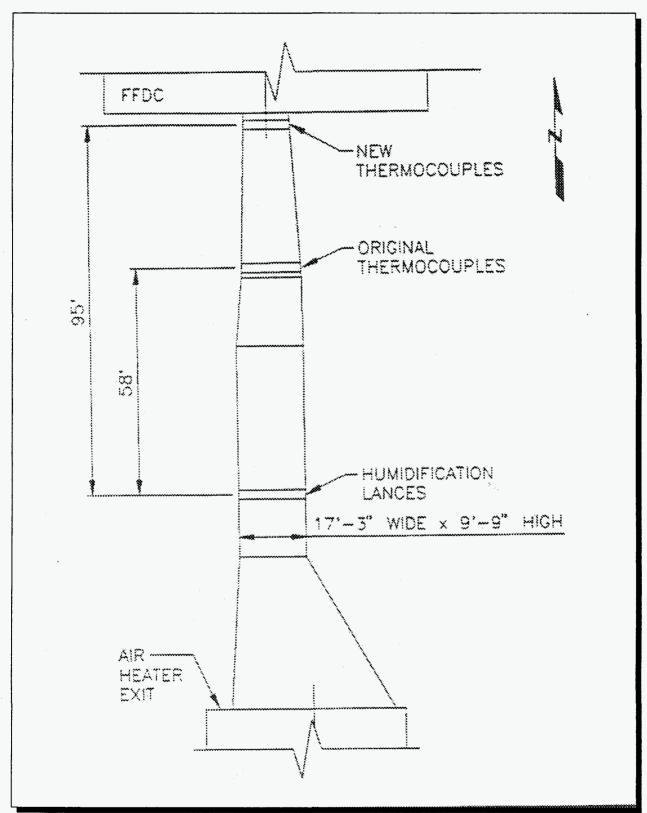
Plant Layout of Flue-Gas Humidification System
